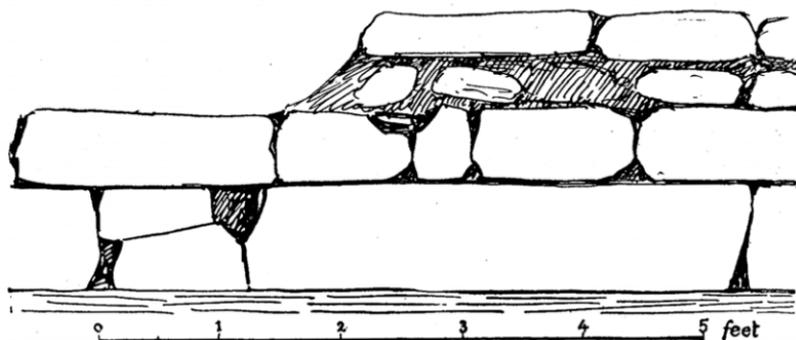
OUTER FACE OF THE NORTH WALL.
